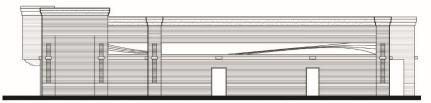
Development Area 2 Mechanic's Building Concept Elevations
